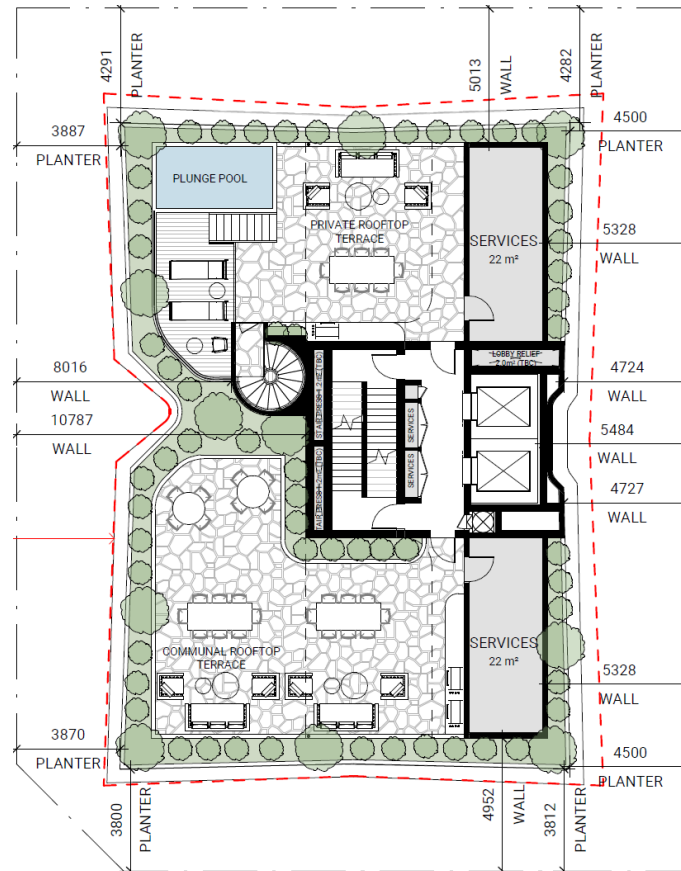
Proposed Roof Terrace Floor Plan (Source: Plus Architecture)
